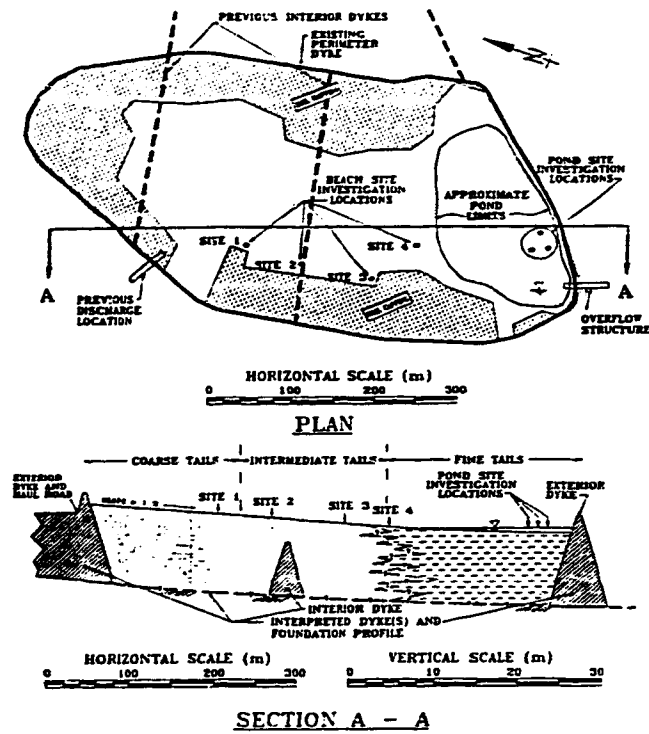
Plan and Section of Coal Valley Tailings Impoundment
